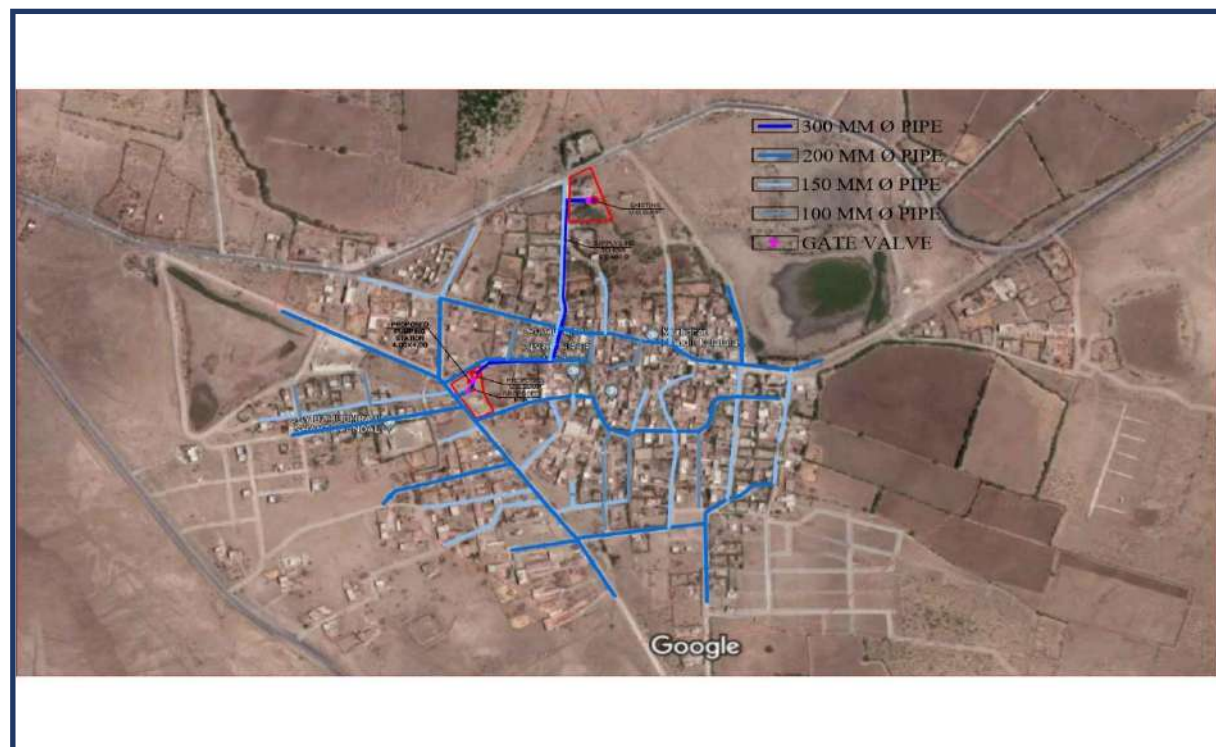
Proposed schematic layout plan of watersupply distribution system.
